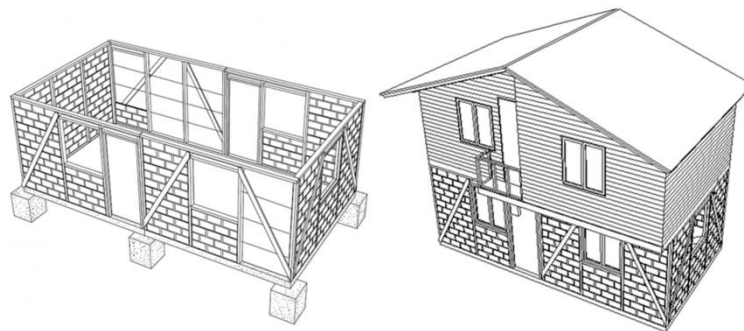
Isometric view of a typical construction and a typical house with a wooden second floor
